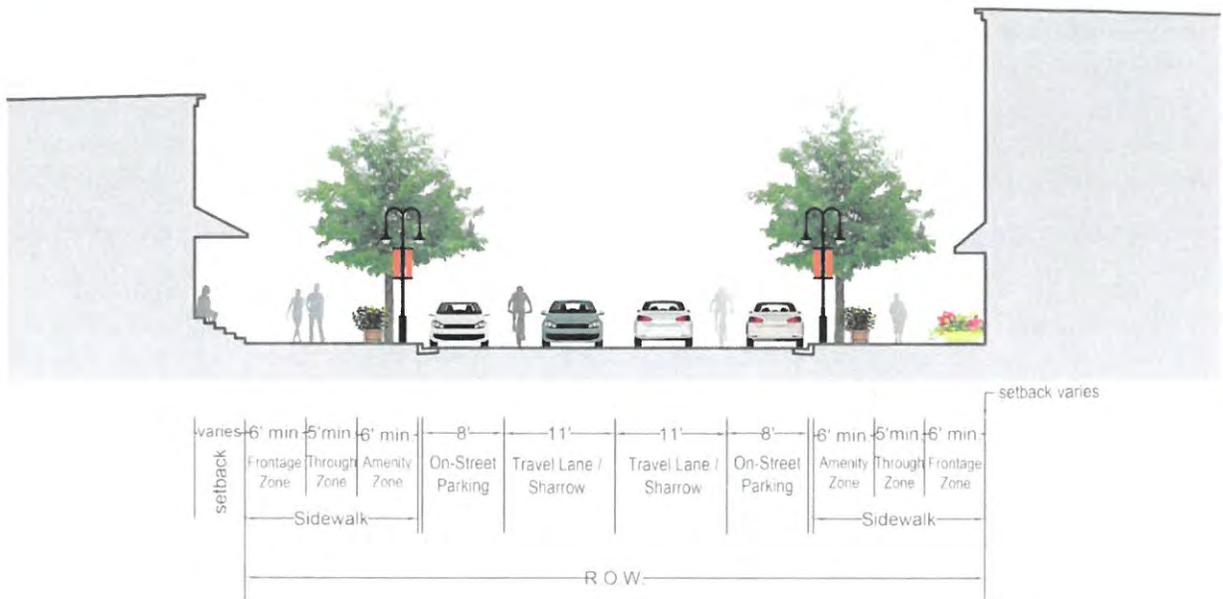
Cross Section Concepts for Streets in the Mixed Use Highway Commercial District
